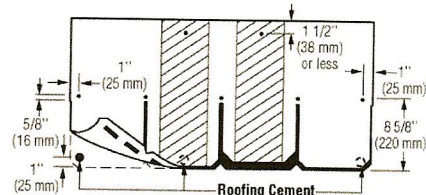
When installing Grand Manor Shingles on steep slopes, use seven nails and three spots of asphalt roofing cement.
